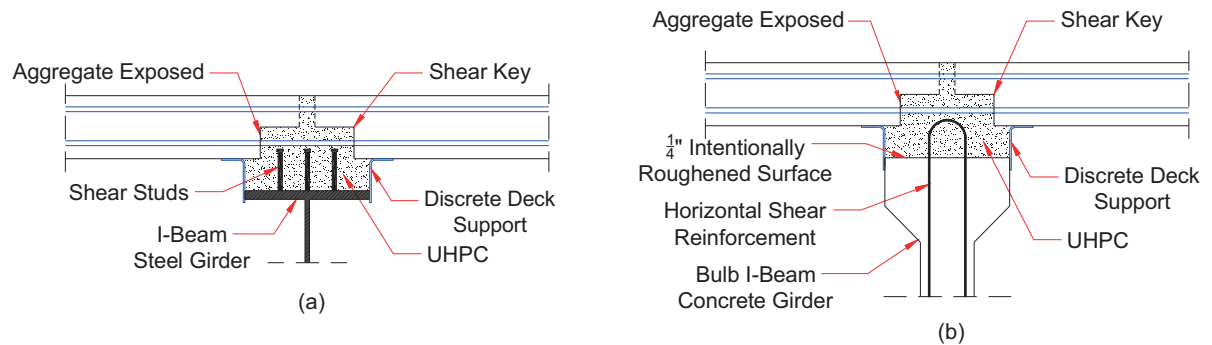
Hidden UHPC Deck-to-Girder Connection in Steel Girder (a) and Concrete Girder (b) (Graybeal 2014)
